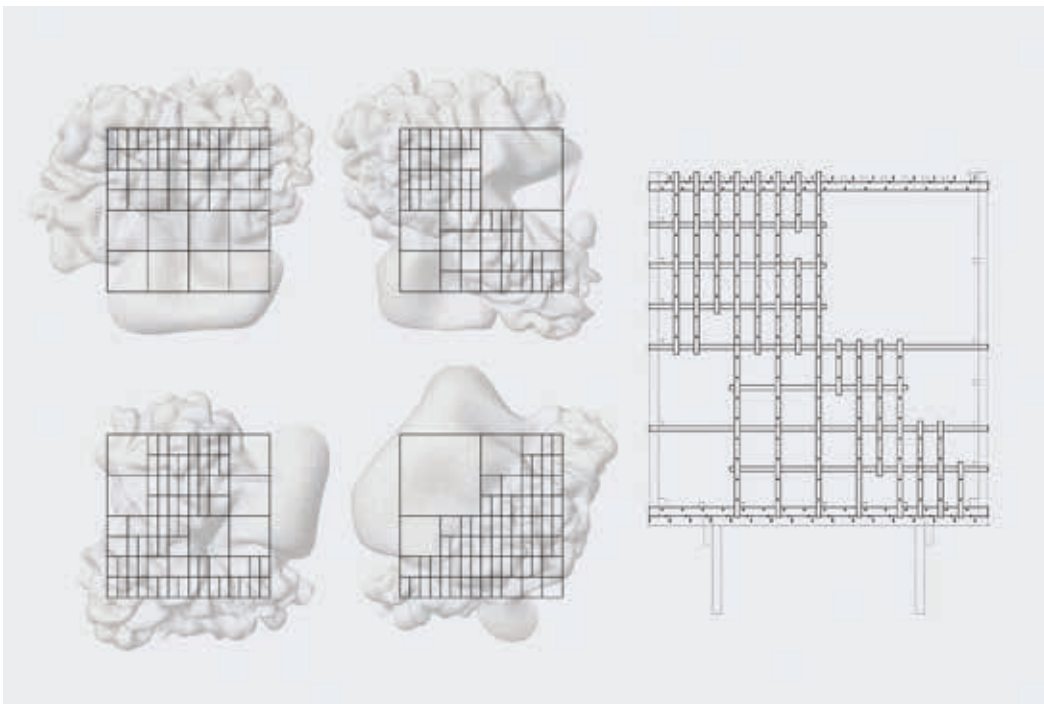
Norell/Rodhe, *Erratic #1*, 2013, elevation and plan drawings showing relation between digitally simulated geometry and armature (top) and construction drawing for armature with location of constraining points (bottom).
